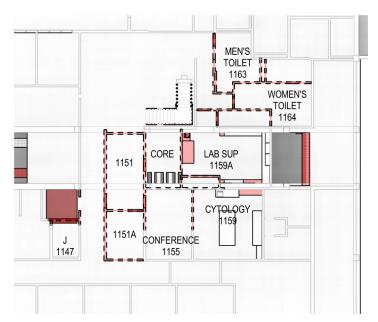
Phasing Diagram Demo Floor Plan, Level 1
